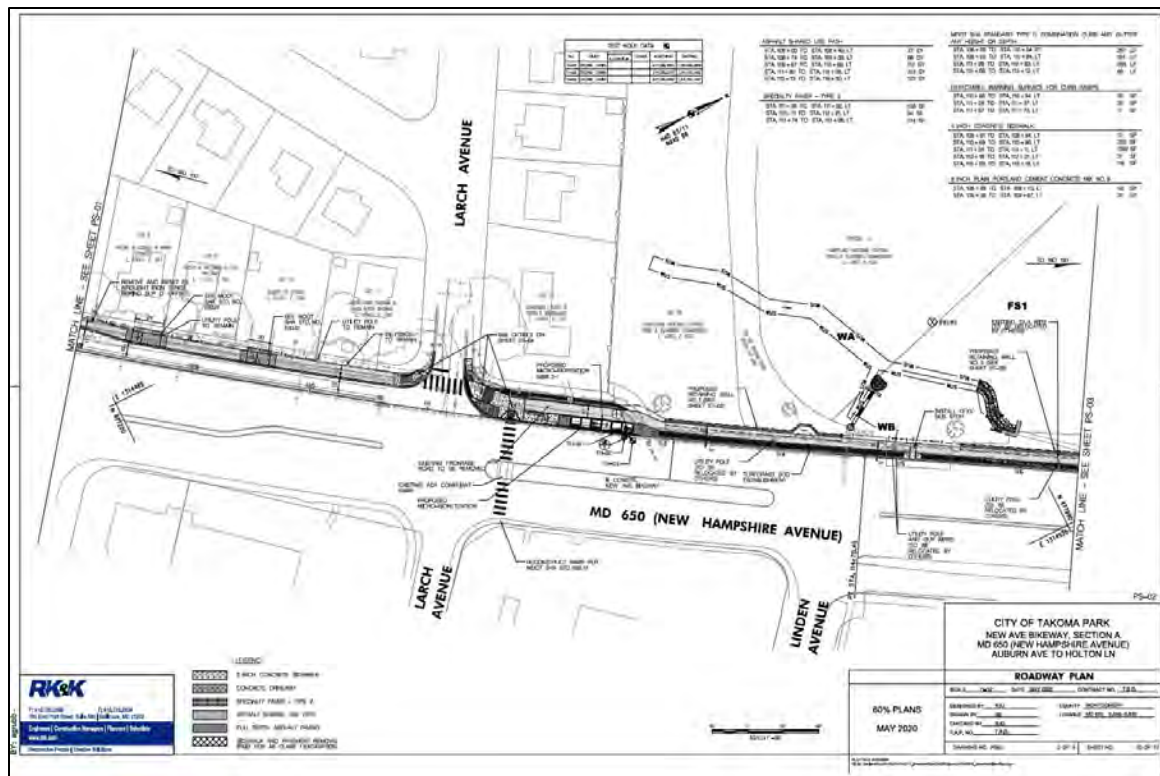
Plan View of Proposed New Avenue Section A Improvements (Part 2)
